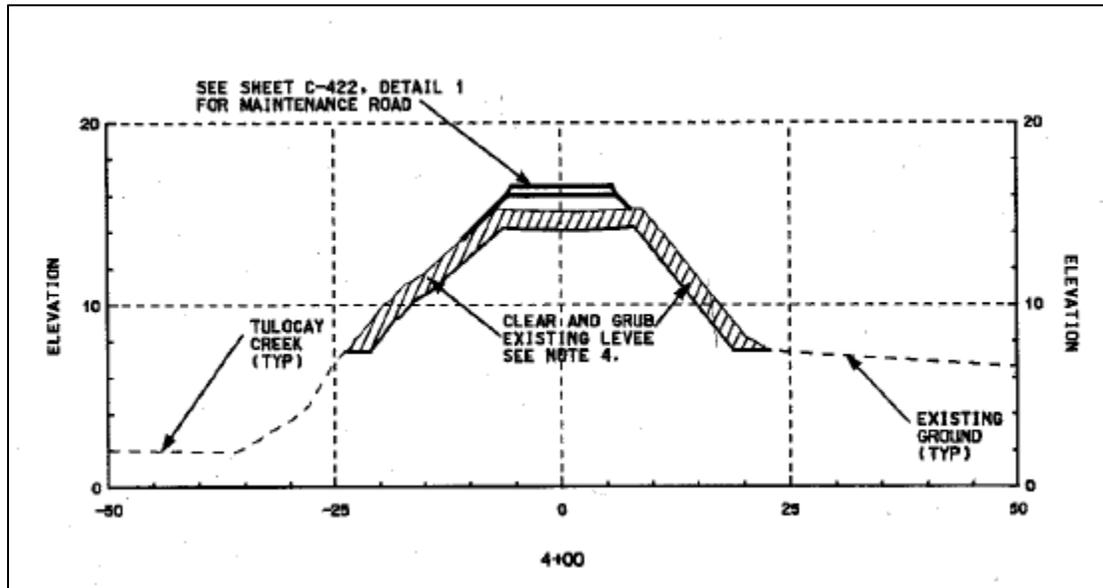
Typical Levee Cross Section Tulocay Creek
